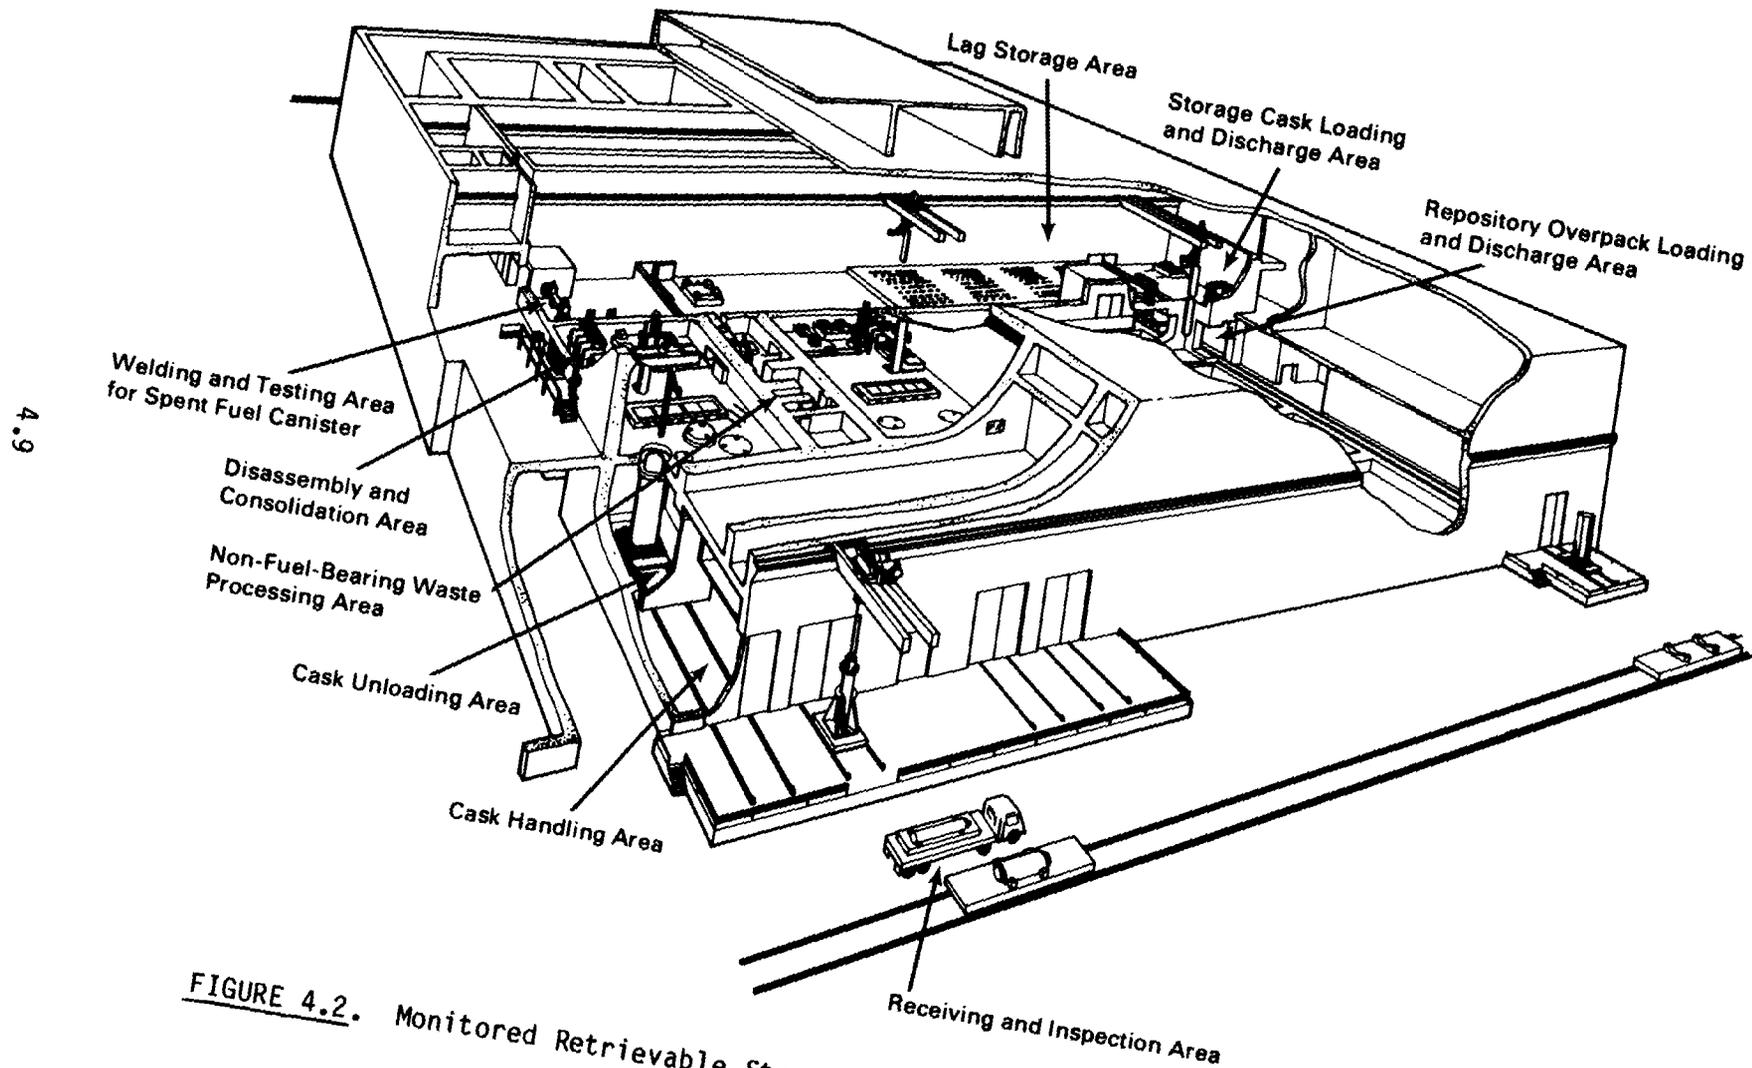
Monitored Retrievable Storage Facility Receiving and Handling Building
